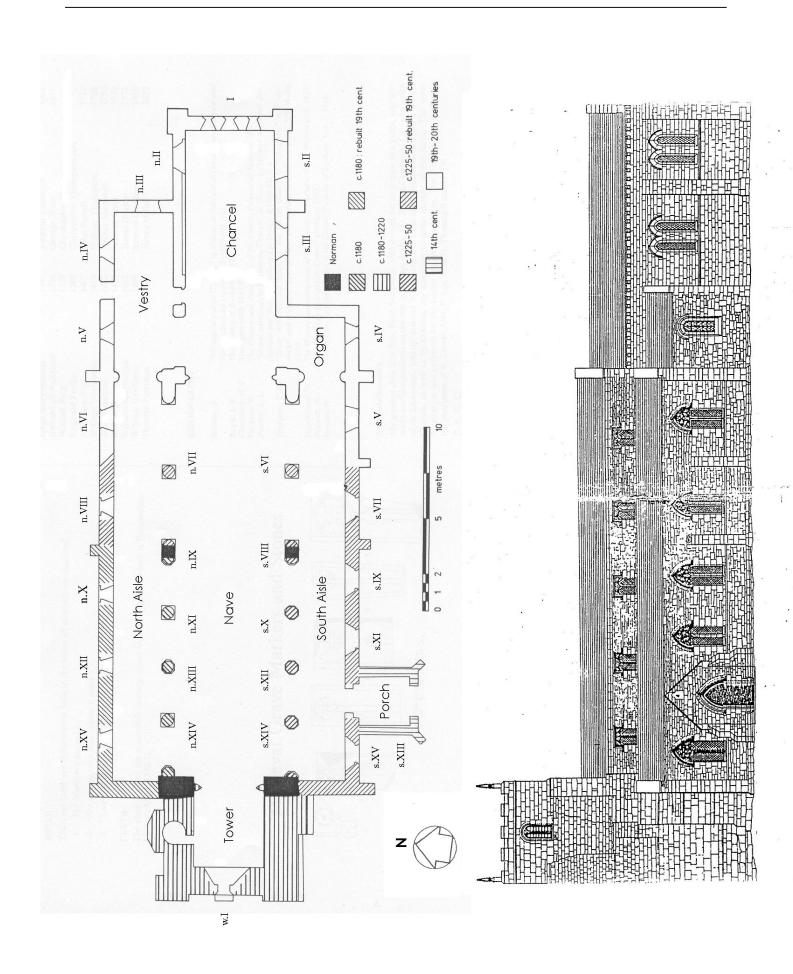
| Church Floor Plan + South Elevation (not to scale)
